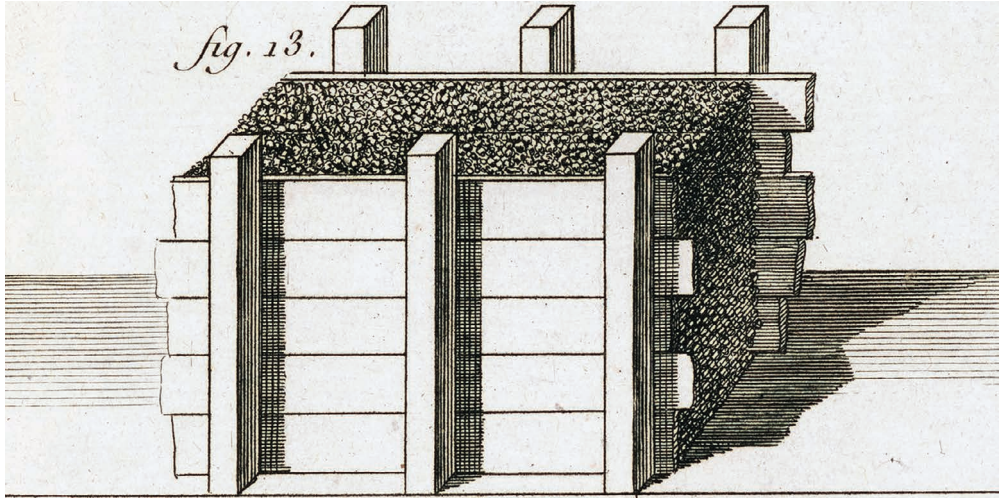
Infill wall based on Palladio's *maniera riempita* (Lucotte 1765: 9, pl. II, detail).
